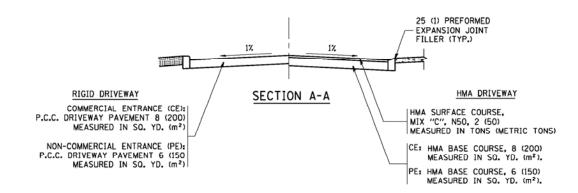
DETAIL FOR CROSSOVERS. DRIVEWAYS. OR PARKING LOTS
